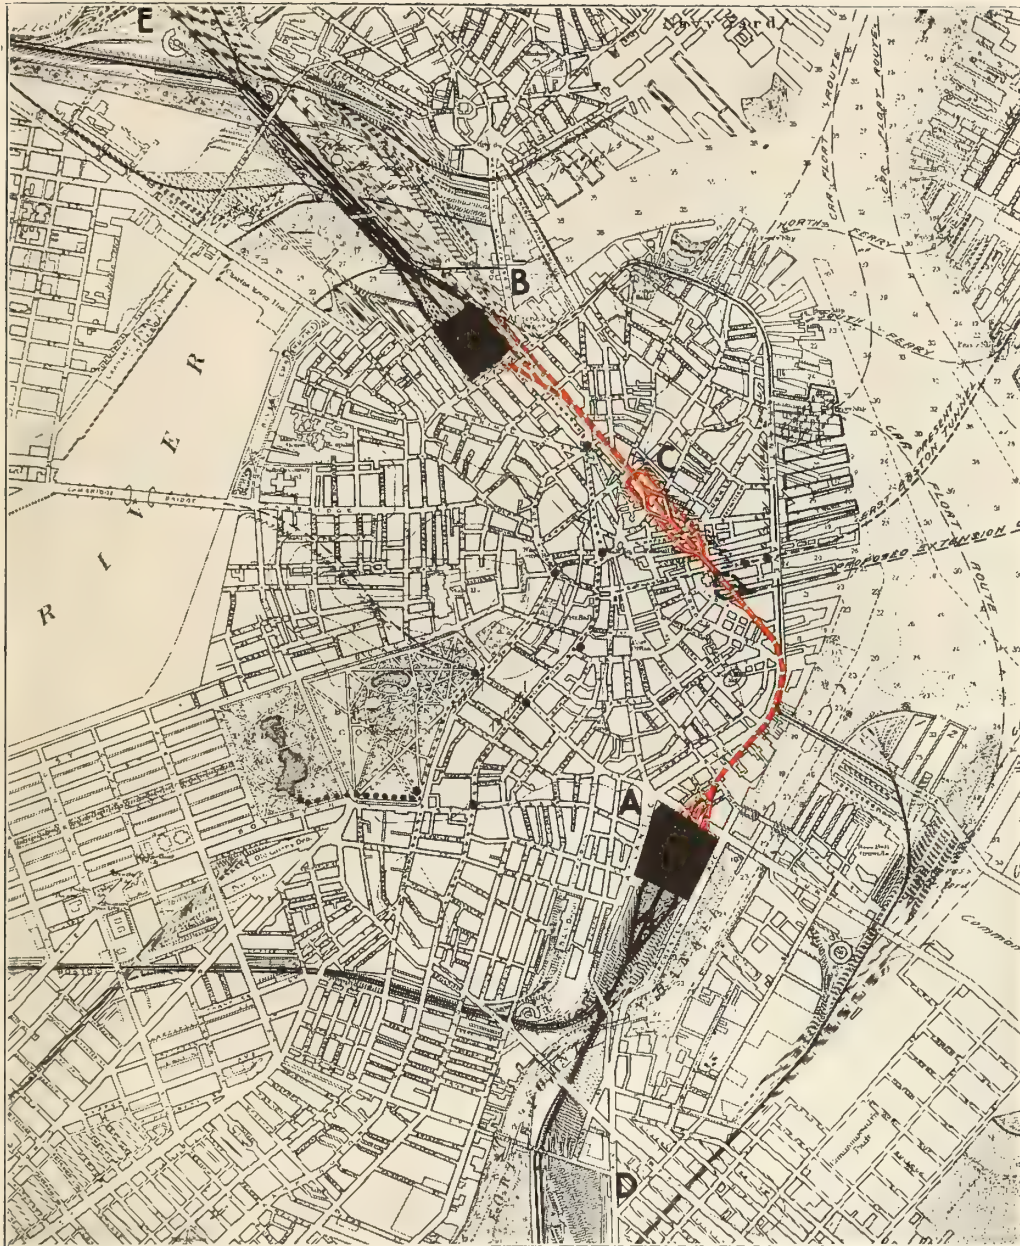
PLAN SHOWING (RED) FOUR-TRACK TUNNEL LINK RECOMMENDED BY THE BOSTON METROPOLITAN IMPROVEMENTS COMMISSION TO CONNECT THE RAILROADS OF THE TWO TERMINALS. 1909.
